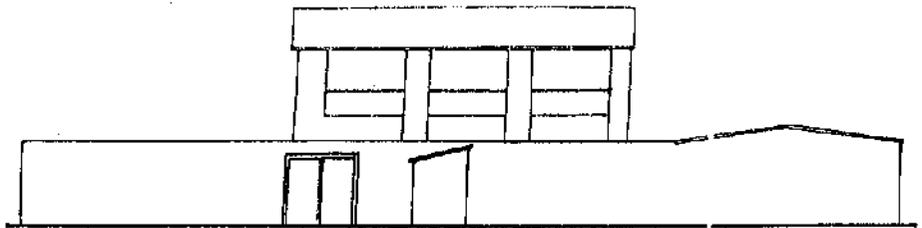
House I: West façade facing the street. The secondary entrance door to the courtyard is at the center (author's drawing).
